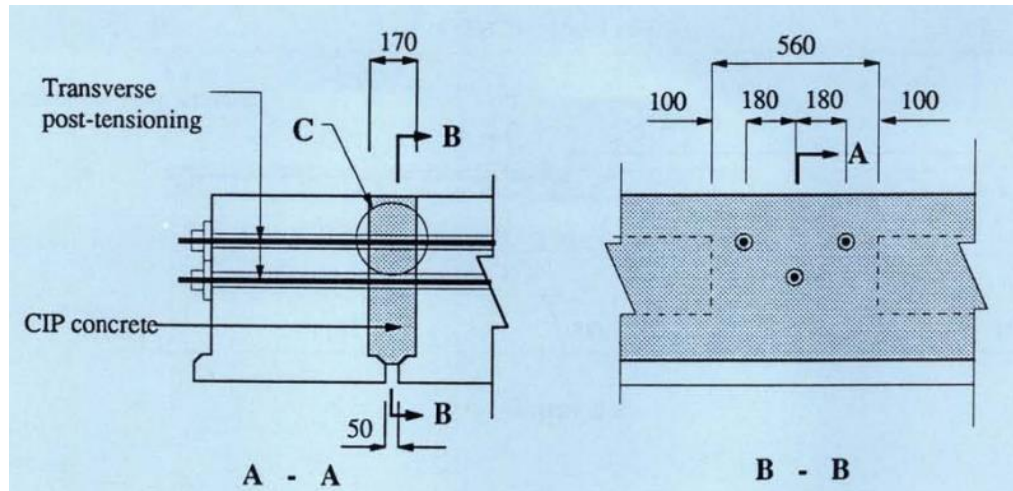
The connection detail used in ABBBs in Japan. El-Remaily et al. (1996).
